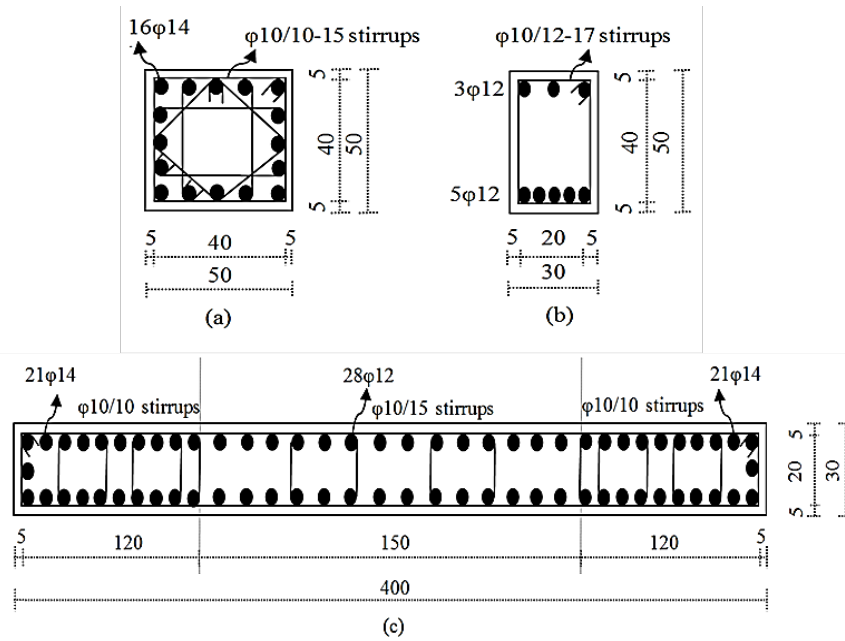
Geometrical and reinforcement details of the structural system no:19 (a)For columns (b)For beams (c) For shear walls(All dimensions are in cm but diameter of rebars are in mm.).
